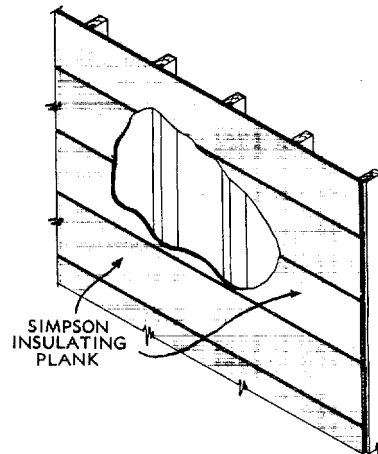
Simpson Insulating Plank Applied Horizontally across Studding.
